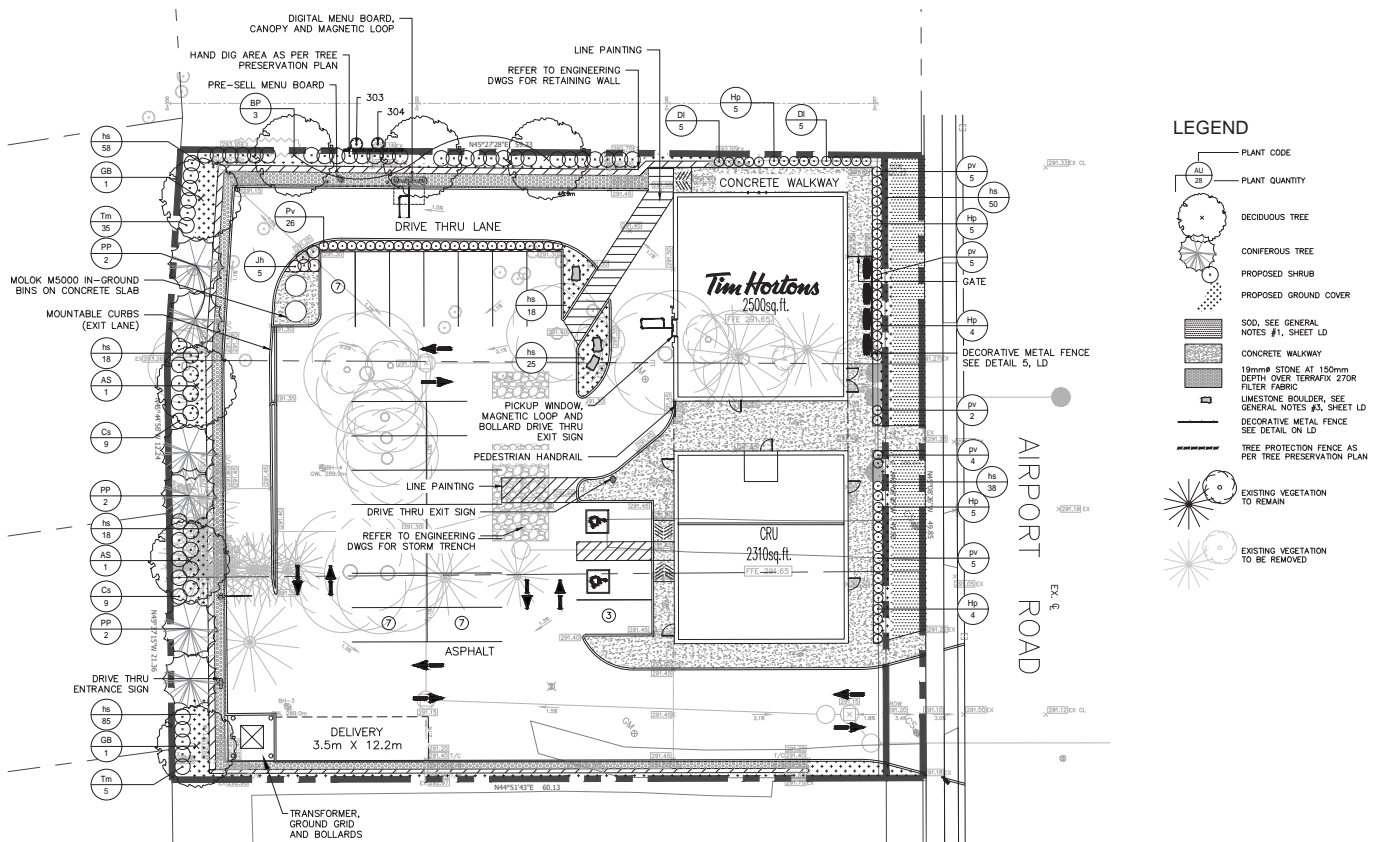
Revised landscape plan. Courtesy of Dillon Consulting
